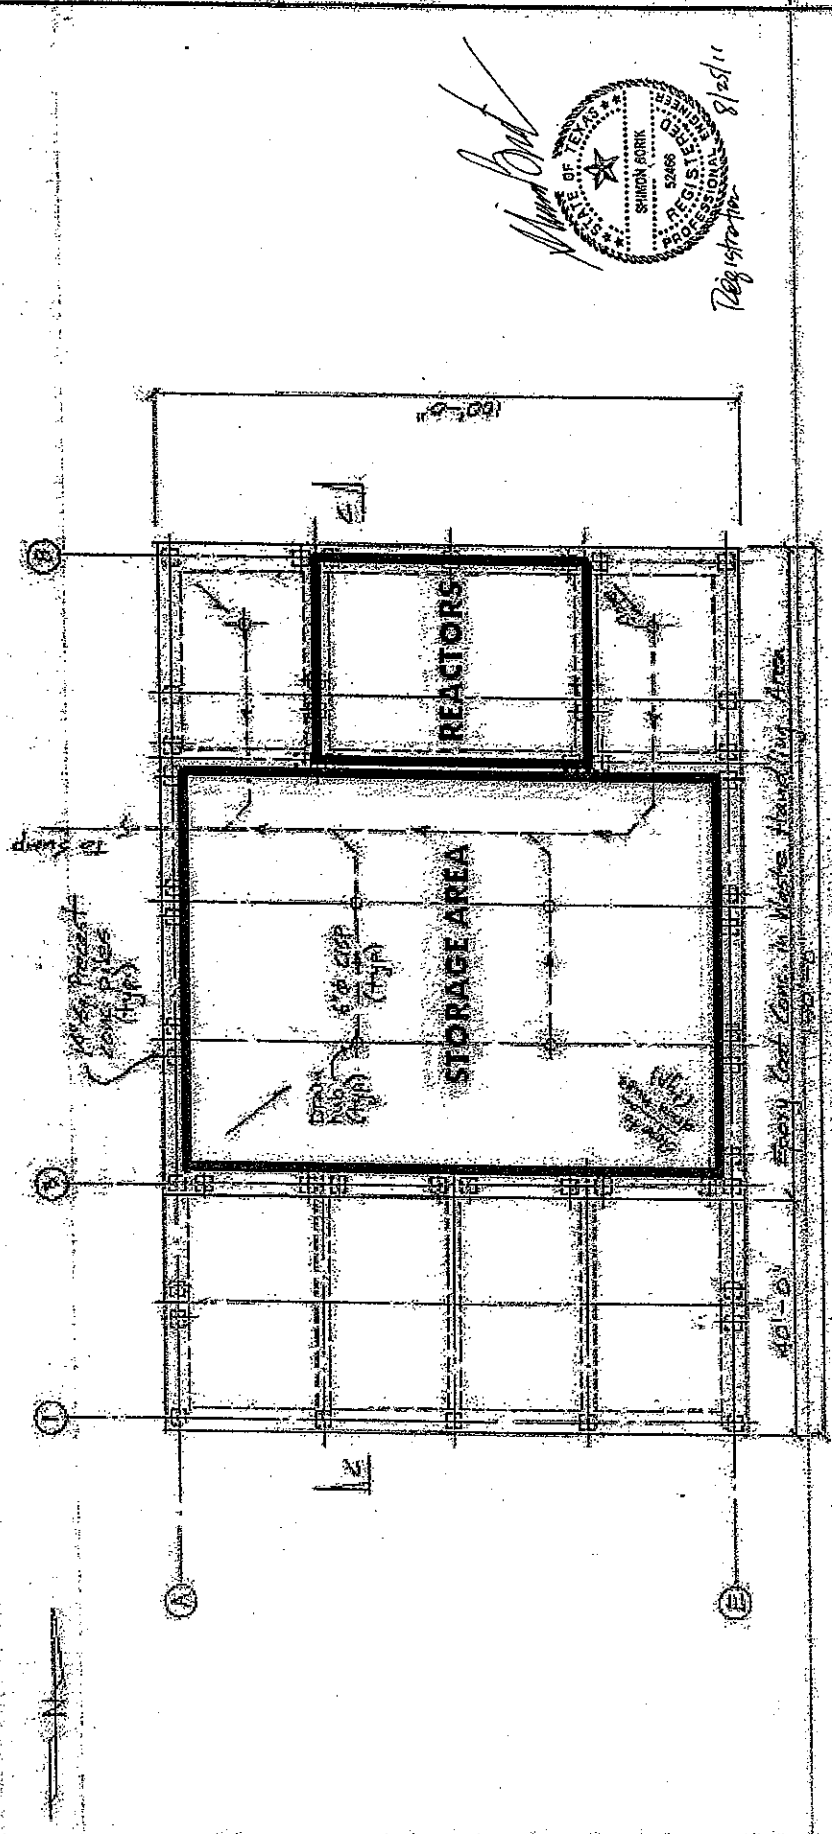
Plan View, Generalized Medical Waste Treatment Facility Foundation Plan
